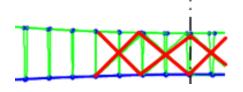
Vertical Bracing Pattern at Center of 40 m Span Footbridge
